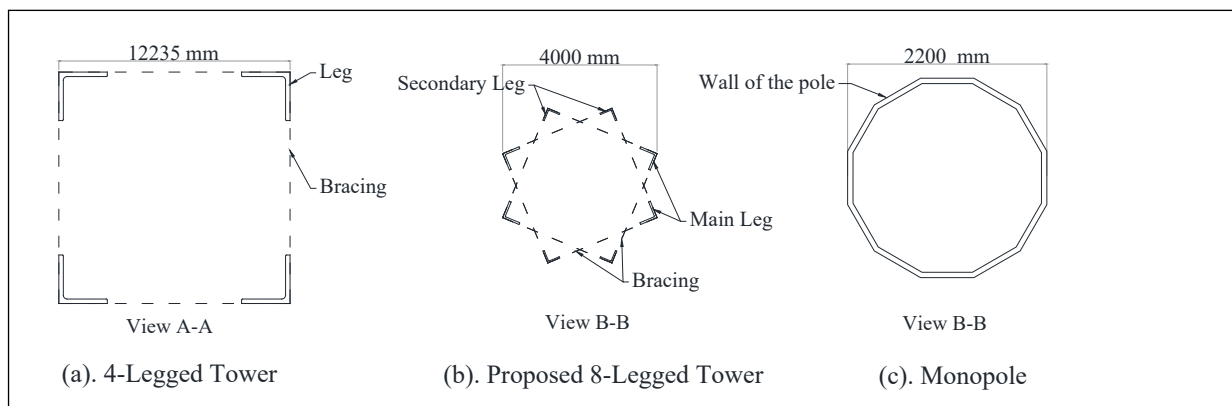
Plan of the 4-legged tower, proposed 8-legged tower and monopole.
